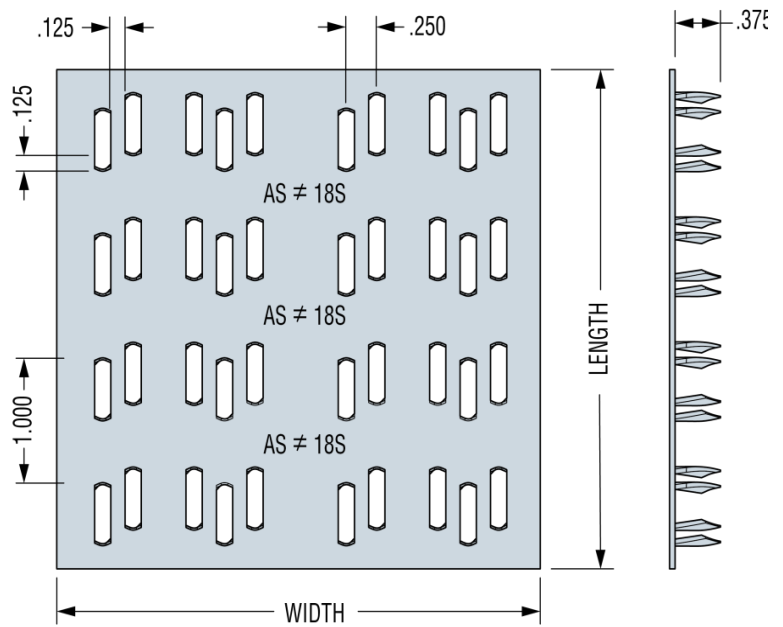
AS 18S5 CONNECTOR PLATE (DIMENSION IN INCHES)
